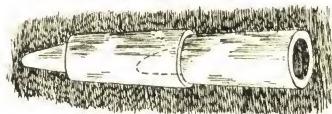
Clay Pipes in Dome of Orthodox Baptistry, Ravenna.
